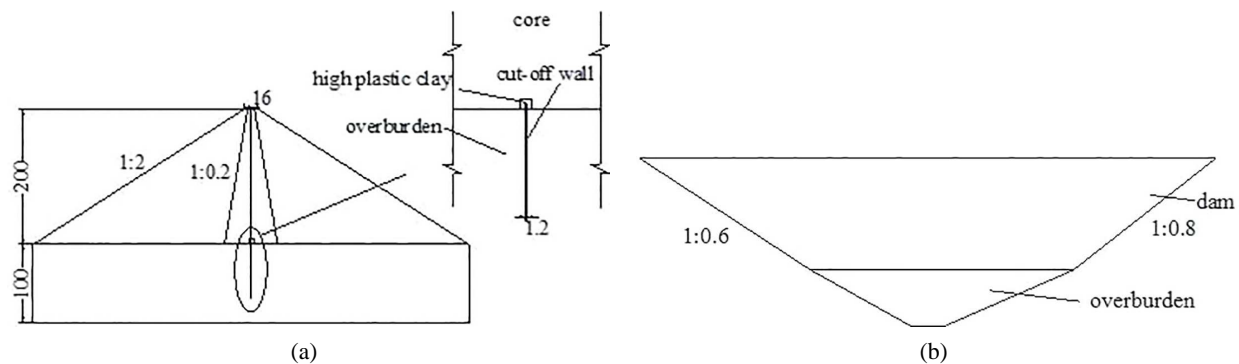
High earth-rockfill dam with deep overburden and its cutoff wall (unit: m): (a) maximum cross section and (b) maximum longitudinal section
